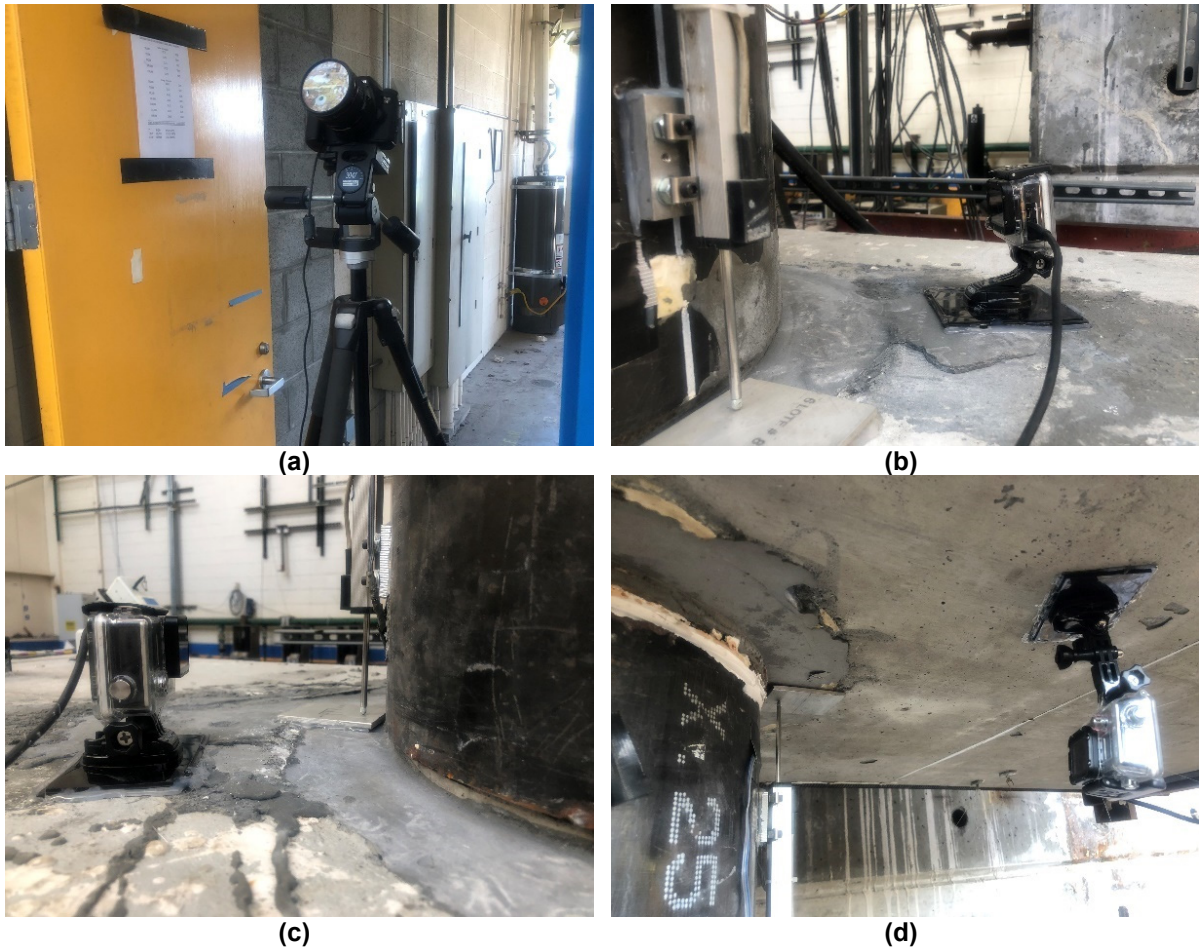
(a) DSLR camera on the north side and GoPro cameras at (b) west column bottom; (c) east column bottom; (d) west column top.
